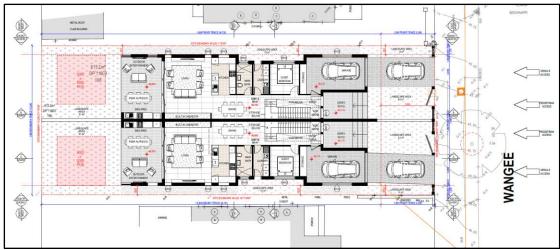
Proposed Site Plan - 253 Wangee Road Greenacre 2190 (Source: Platform 5 Design, 2022)
